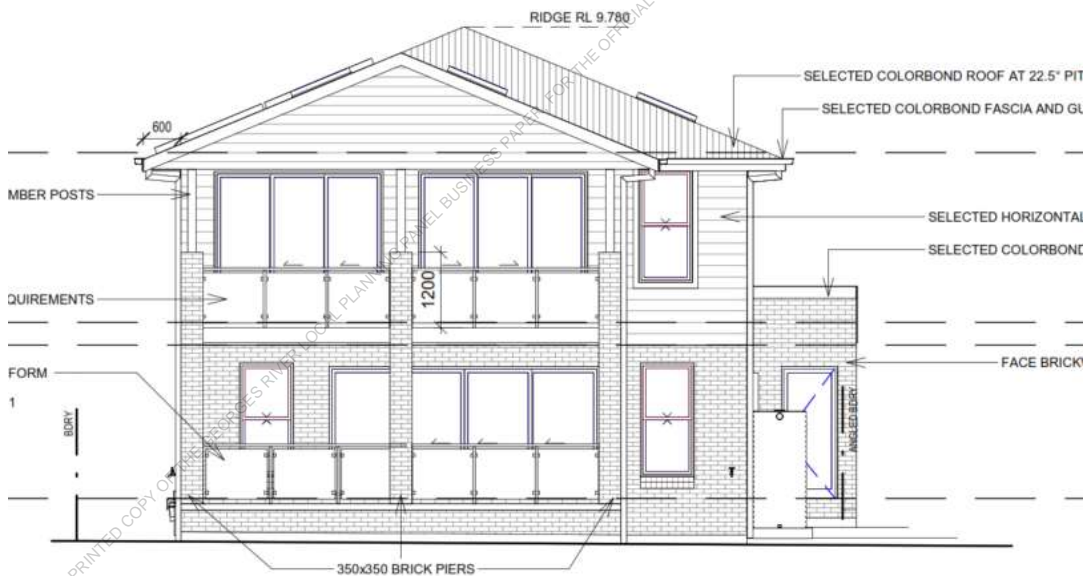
West Elevation (Source: G.J. Gardner Homes Sydney South)
